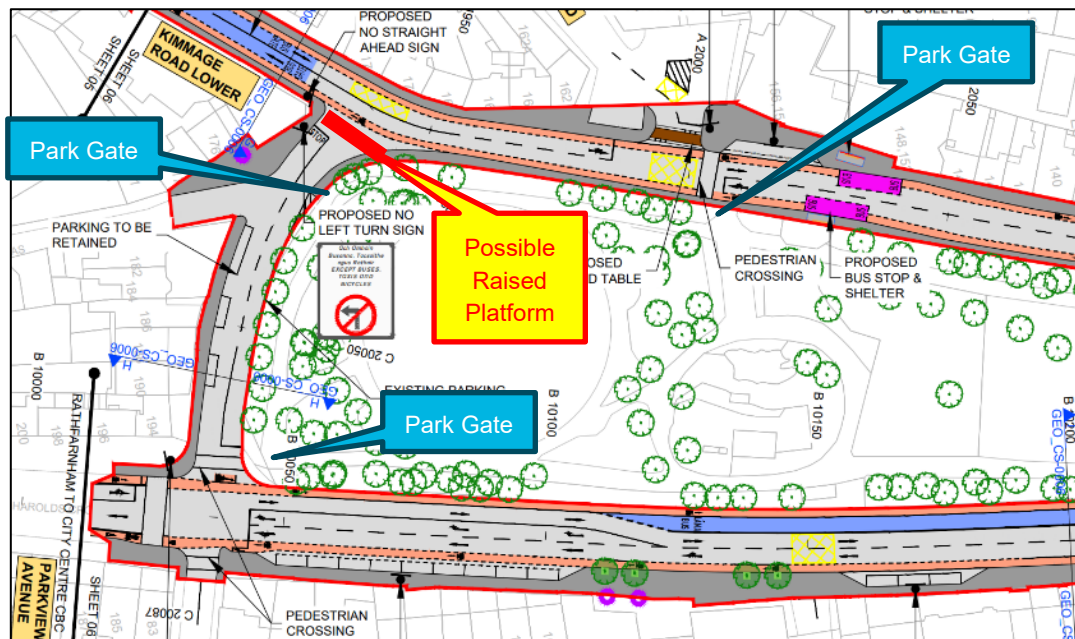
Snapshot from General Arrangement Drawing Sheet No.6
